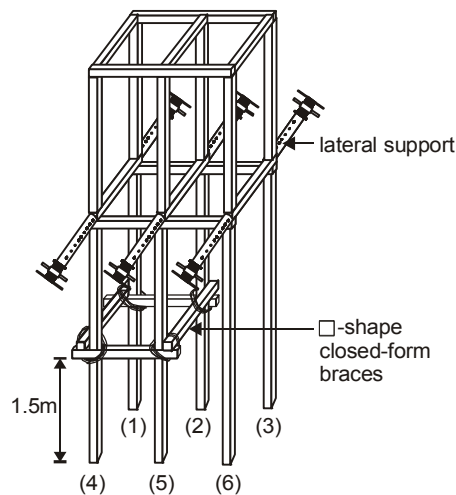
Arrangements of Double-layer Shoring Systems with Horizontal Braces
